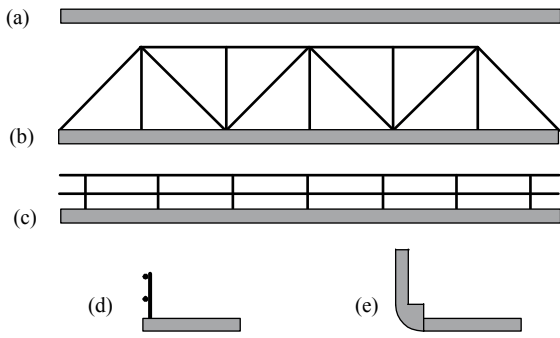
Investigated bridge types: Frontal view of (a) reference bridge, (b) truss bridge, (c) railing bridge and cross-sections of (d) railing bridge and (e) baffle bridge
